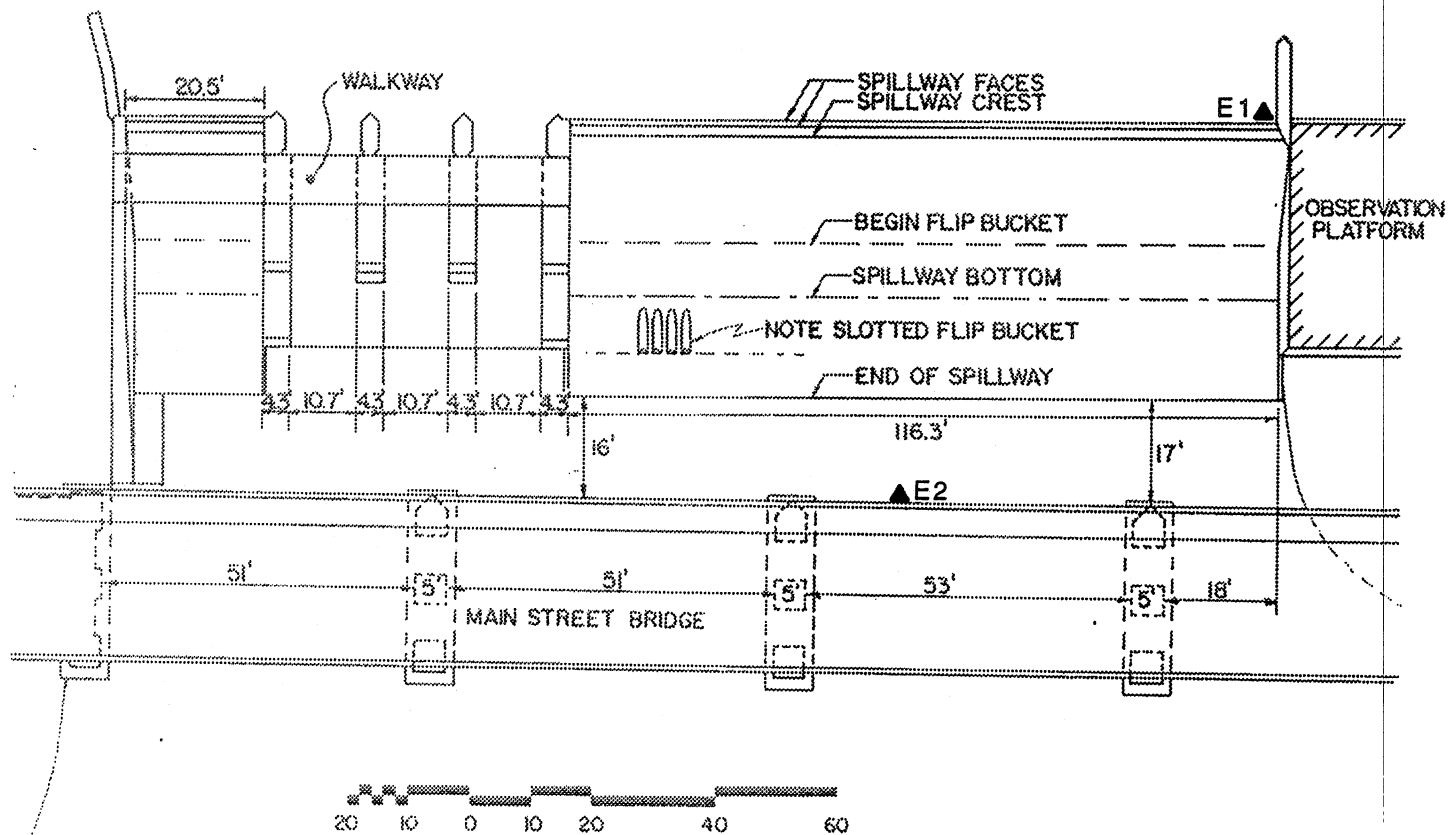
Plan view, December 6, 1985, sampling locations.
